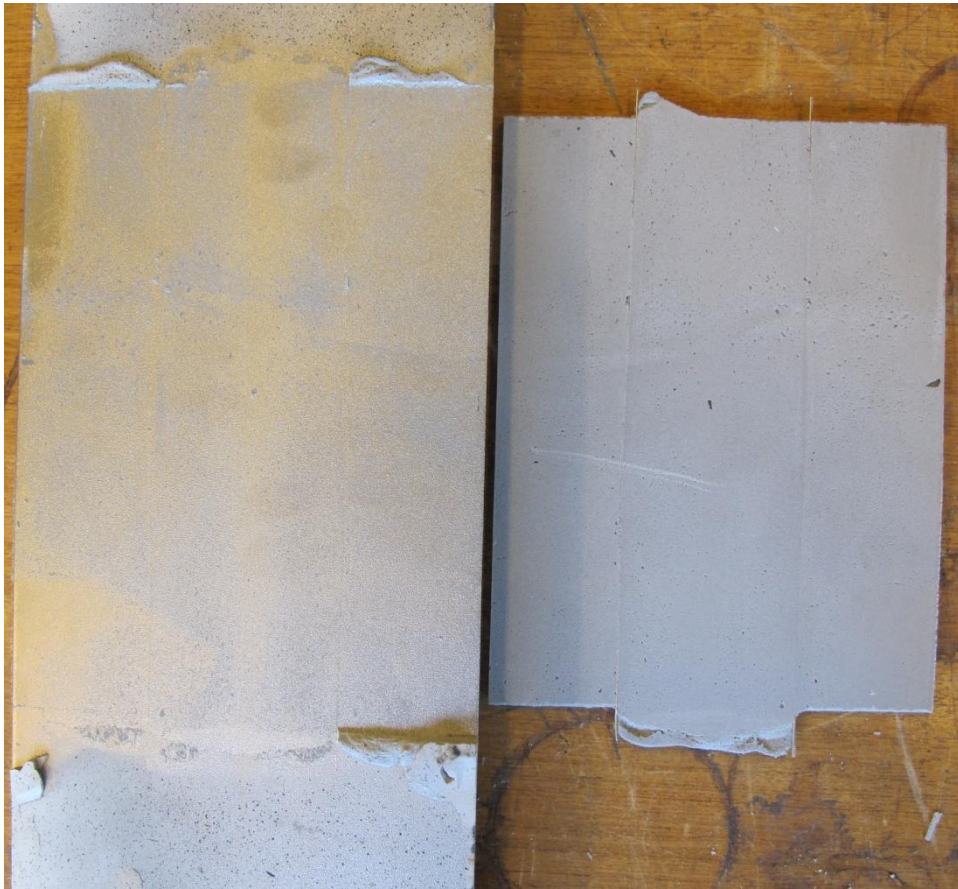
Connection 4 – side 1 – direction z+ (left side) and direction z- (right side) – third adhesive layer – complete delamination caused by adhesion failure
